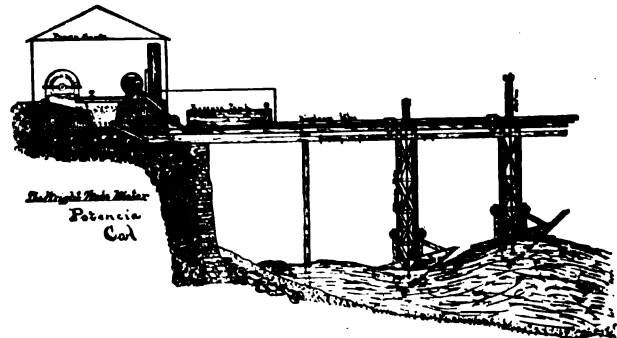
SIDE VIEW OF POWER HOUSE AND SECTION OF WAVE MOTOR WHARF, SHOWING TWO FLOATS.
